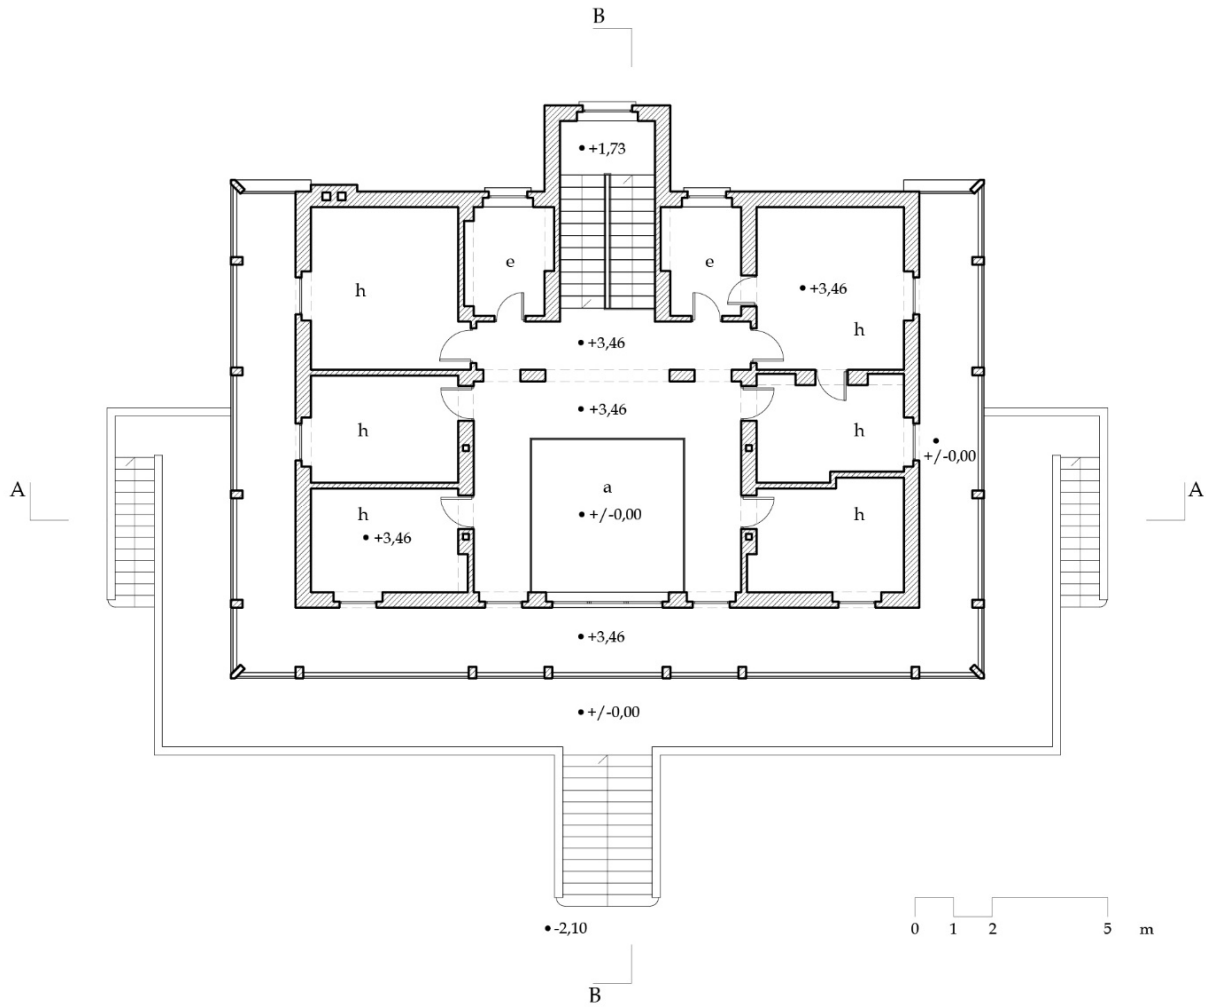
Villa Colli, first floor (section plan at +4,66 m): a) double-height hall; e) bathroom; h) bedroom.
